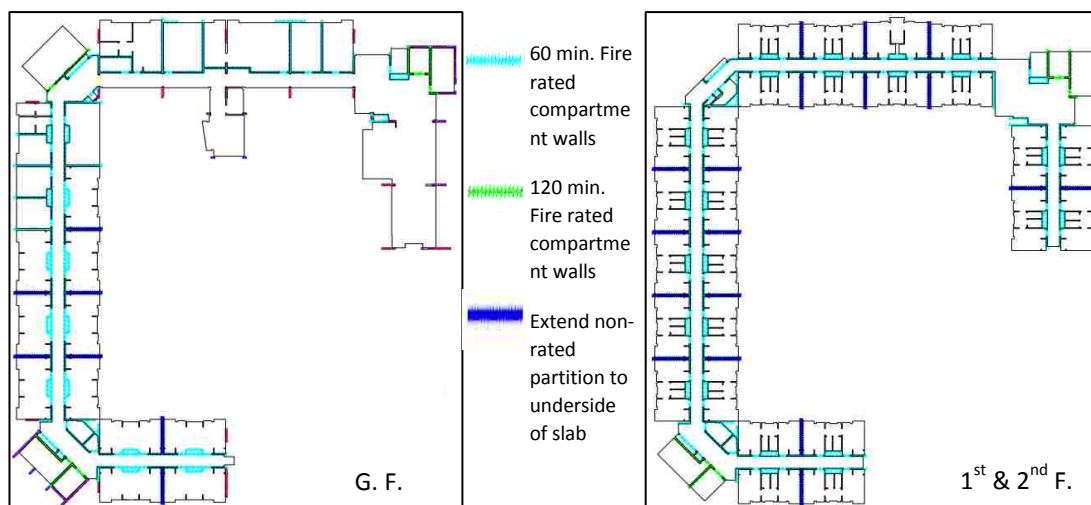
Typical Fire Separation Plans (FSP) in NC hostel
